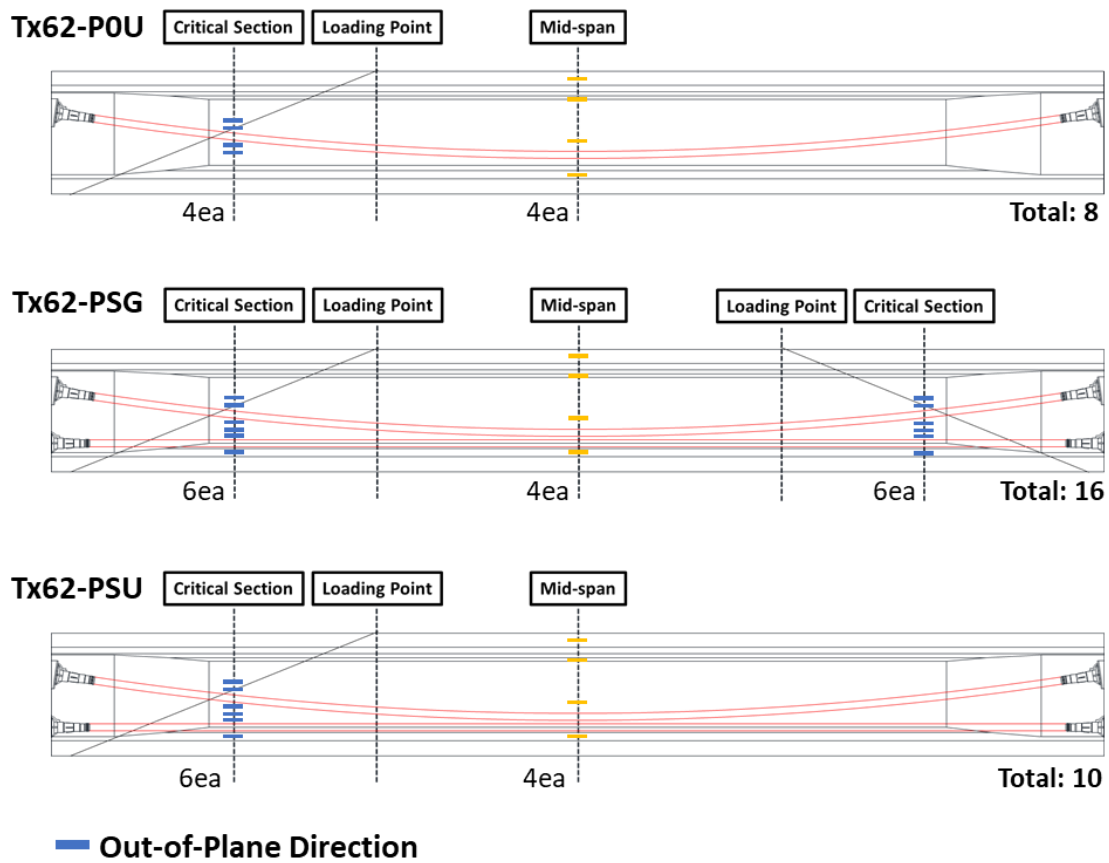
Proposed Location of VWGs for the Test Specimens Containing the Ungrouted Tendon
